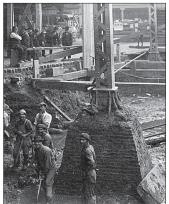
This brick El footing near the Staten Island Ferry Terminal was photographed in October 1904. It is identical to a similar footing uncovered during excavations for the new South Ferry Station.
